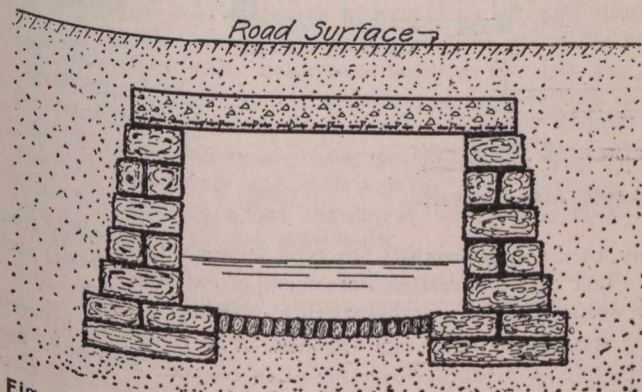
Reinforced Concrete Slab on Masonry Abutments.
